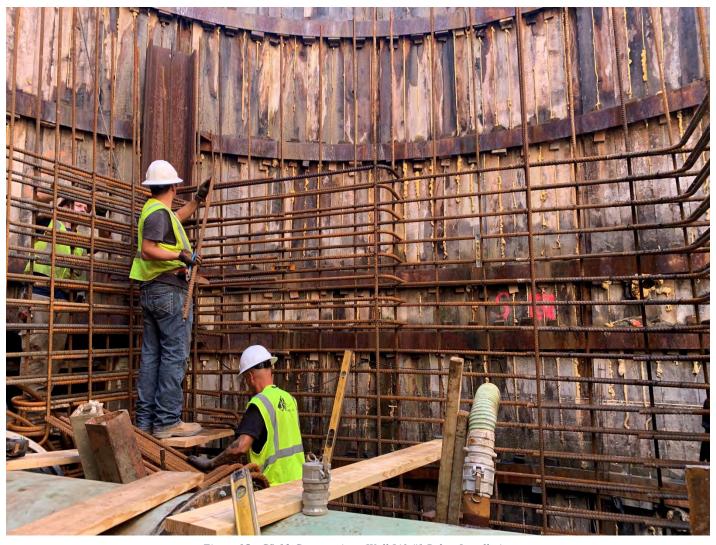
CS-13 Construction - Wall Lift #1 Rebar Installation
